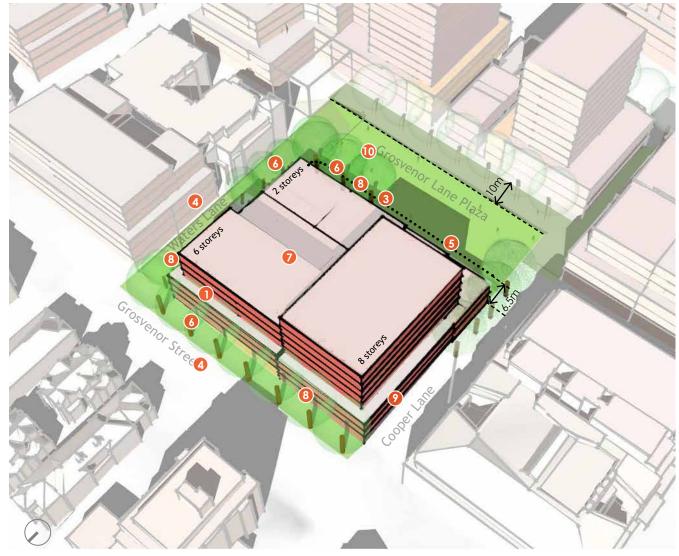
Illustrative aerial looking south-east. Building height increases transition with the surrounding residential area and are in keeping with the character of Grosvenor Street. Additional tree planting along Grosvenor Street and upper level setbacks further limit the visual impact.
